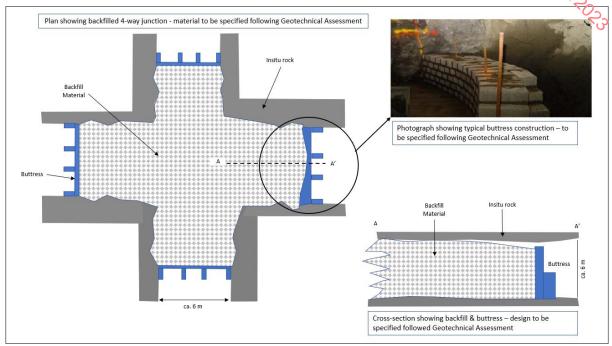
Schematic plan and cross-section for the backfilling of a 4-way junction
